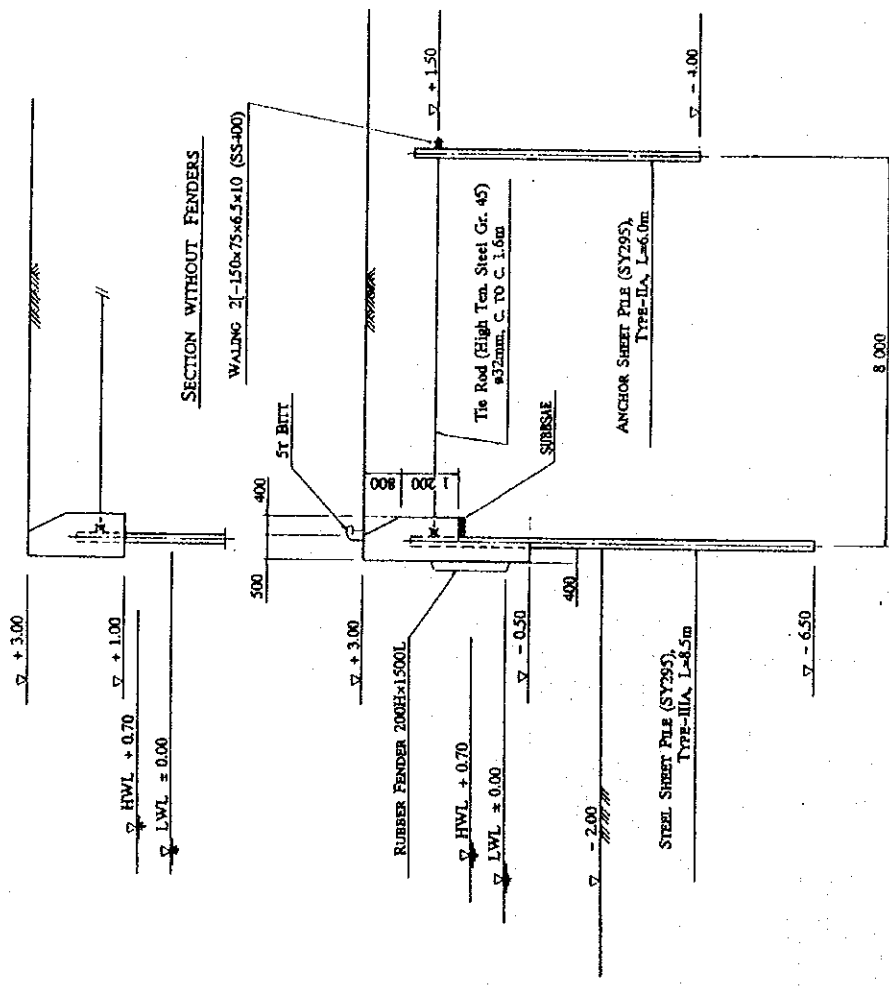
(2) Typical Cross Section of Main Wharf (Alternative Plan 3)
